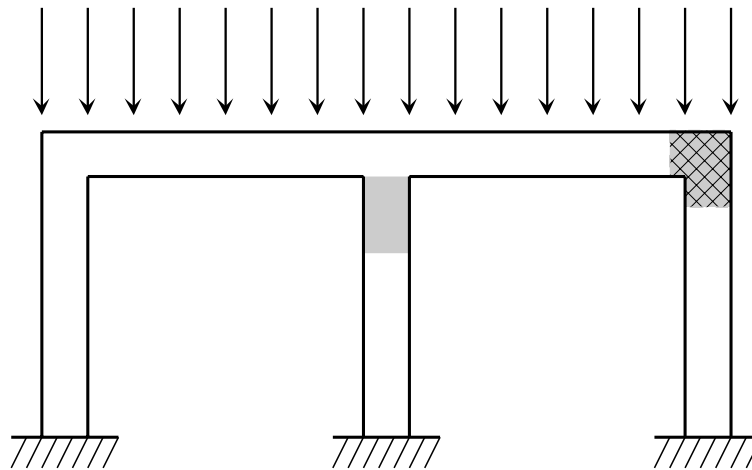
A three columns – one storey concrete frame. Two different damages are supposed to act, alternatively on the structure. The damage acting on the top right joint (indicated as grey shaded transversal black hatchings) represents the first situation. Otherwise, the plain grey area represents the second damage situation, from [6].
